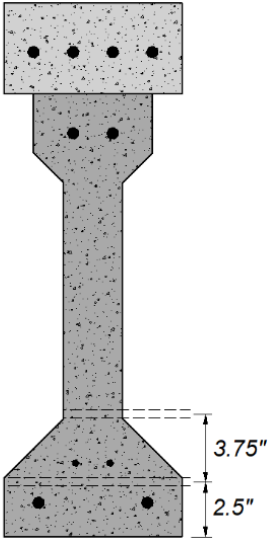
Vertical location of drilled holes for anchoring repair reinforcement
